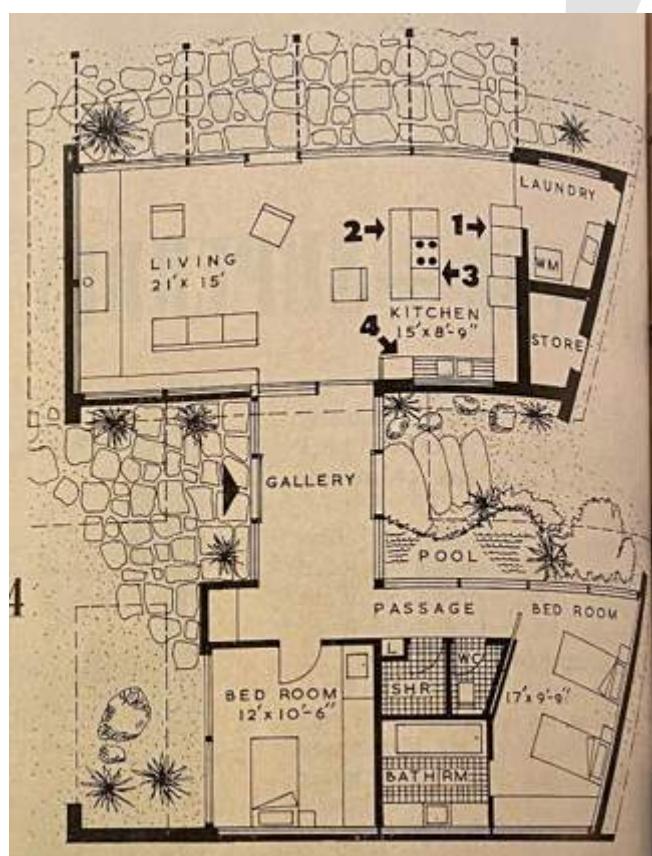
Site plan of the residence at 14 Fairway Avenue, 1963 (Source: *Australian House & Garden*, April 1963, p 42)
